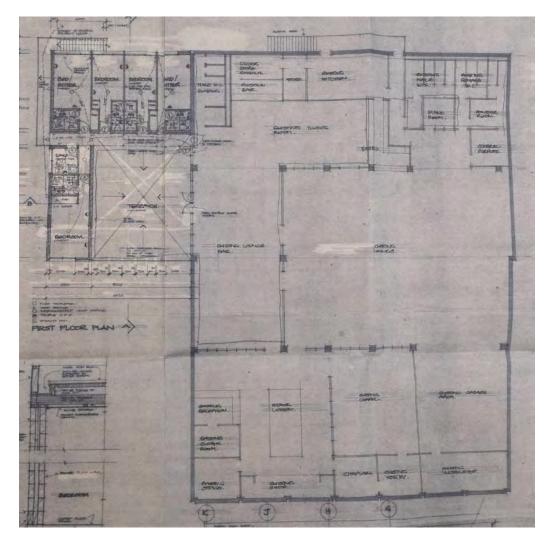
Detail of the building plan prepared for the 1981 alterations to the Stella Maris Club. (Source: PROV VPRS 7882/P1 unit 2017)
